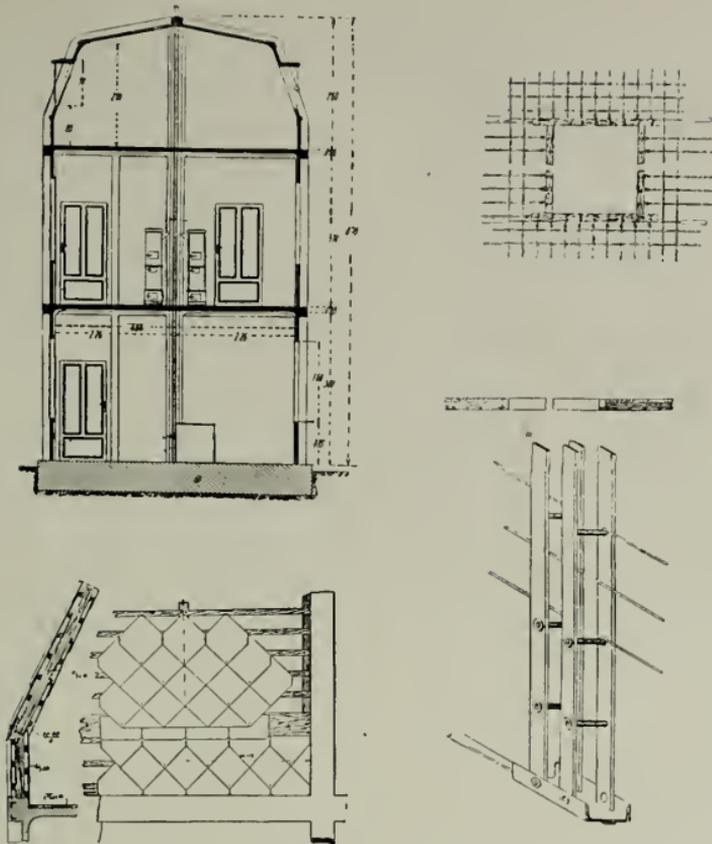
(left top) shows section of Building shown in Fig. 2. Fig. 4 (bottom right) is detail of Wall and Window Opening. Figure 5 (bottom left) is a detail of the Roof Construction
